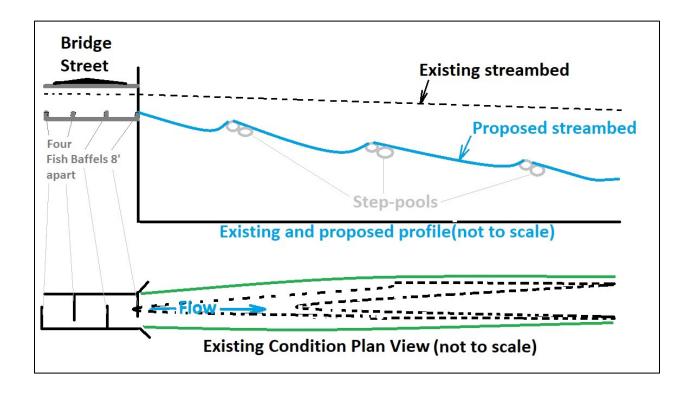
EXISTING AND PROPOSED CONDITION CROSS-SECTION
